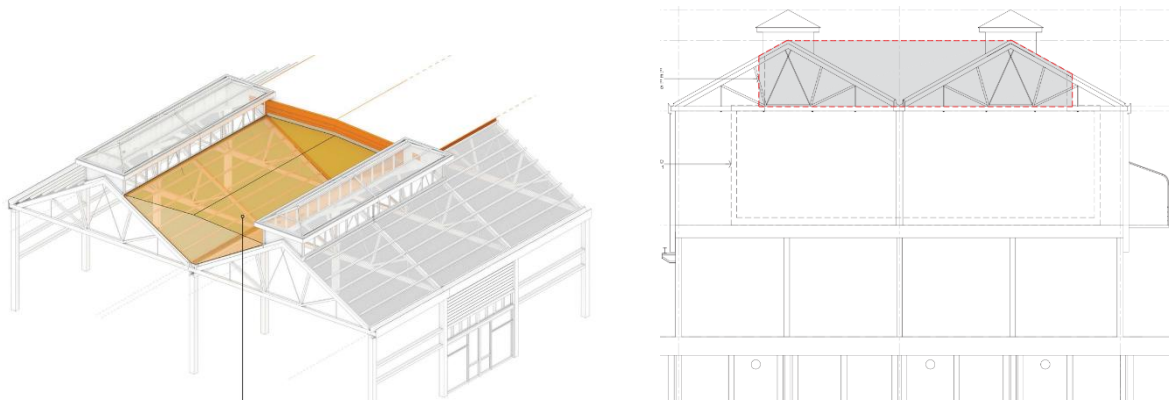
3D showing the new roof shell to be built between the existing lanterns. Drawing by Hassell.
